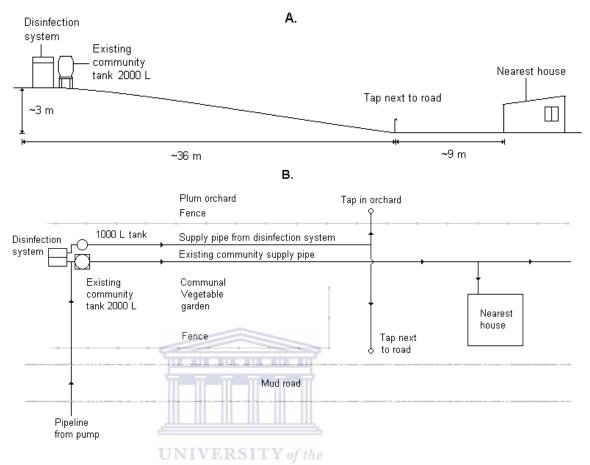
Schematic plan views of site. A. Eye level view. B. Overhead view showing existing pipelines and those of the disinfection system with two taps.
